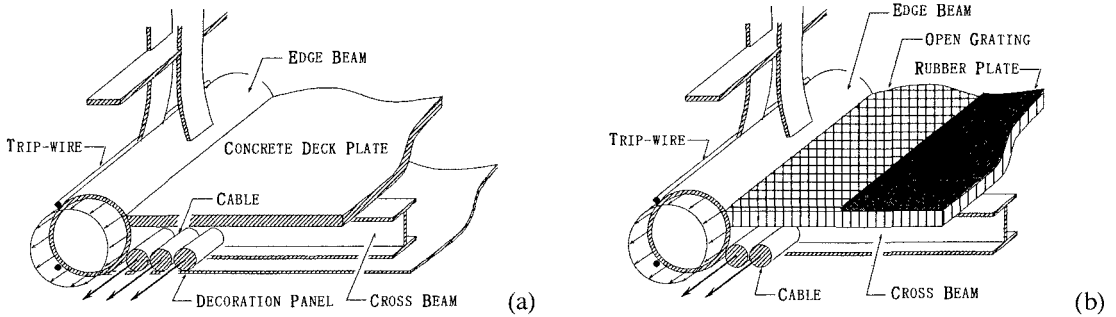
Cross-sections of the previously proposed steel structure (a) and an improved lighter steel one (b).
